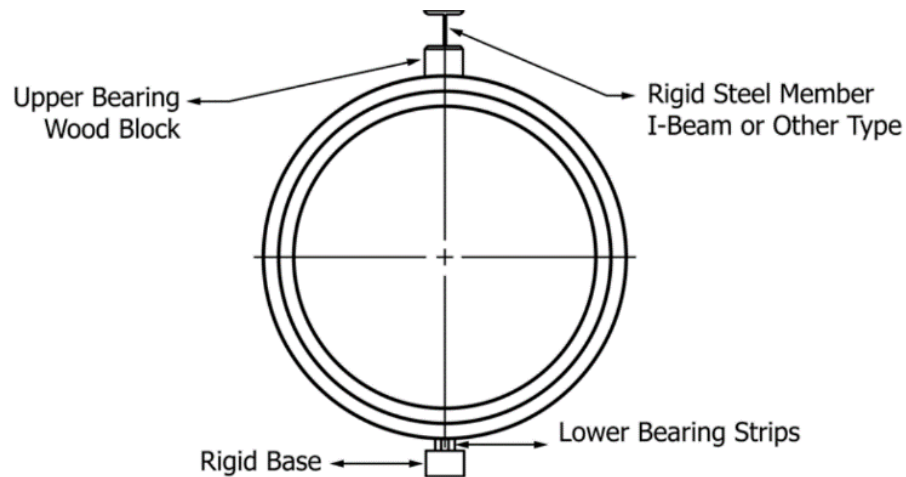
Three edge bearing tests setup, ASTM C497 [38]
